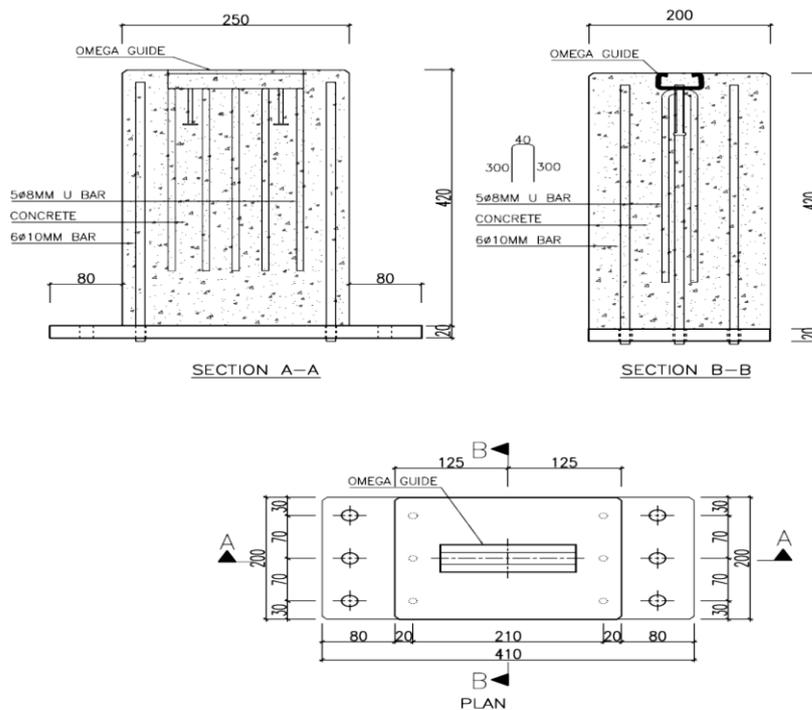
Specimen with reinforcement bars welded to the channel
